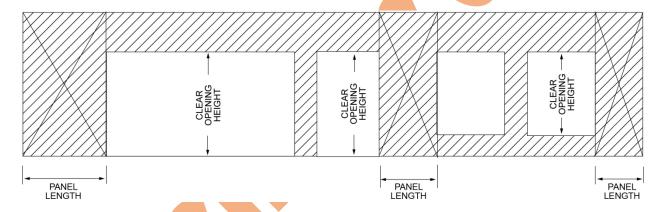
BRACED WALL PANELS WITH CONTINUOUS SHEATHING
